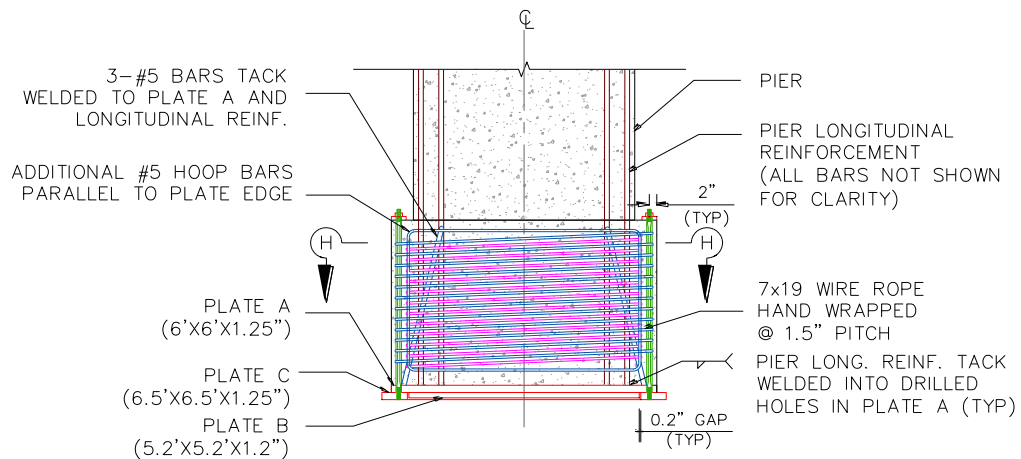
Reinforcement Detail of Single and Twin DAD Pier
